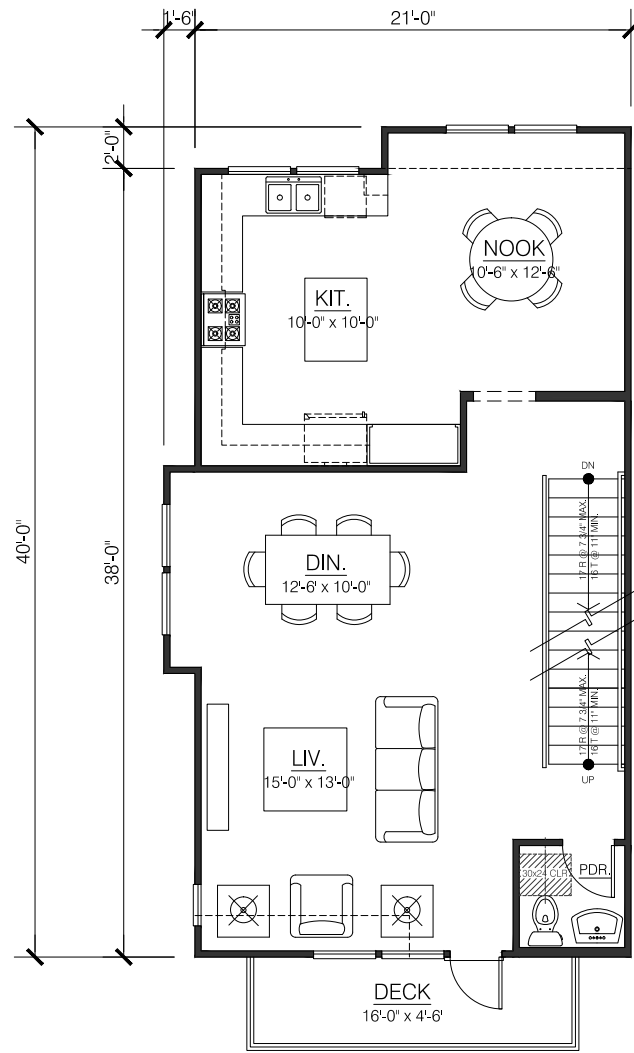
PLAN 1.1 ALL FLOORS
